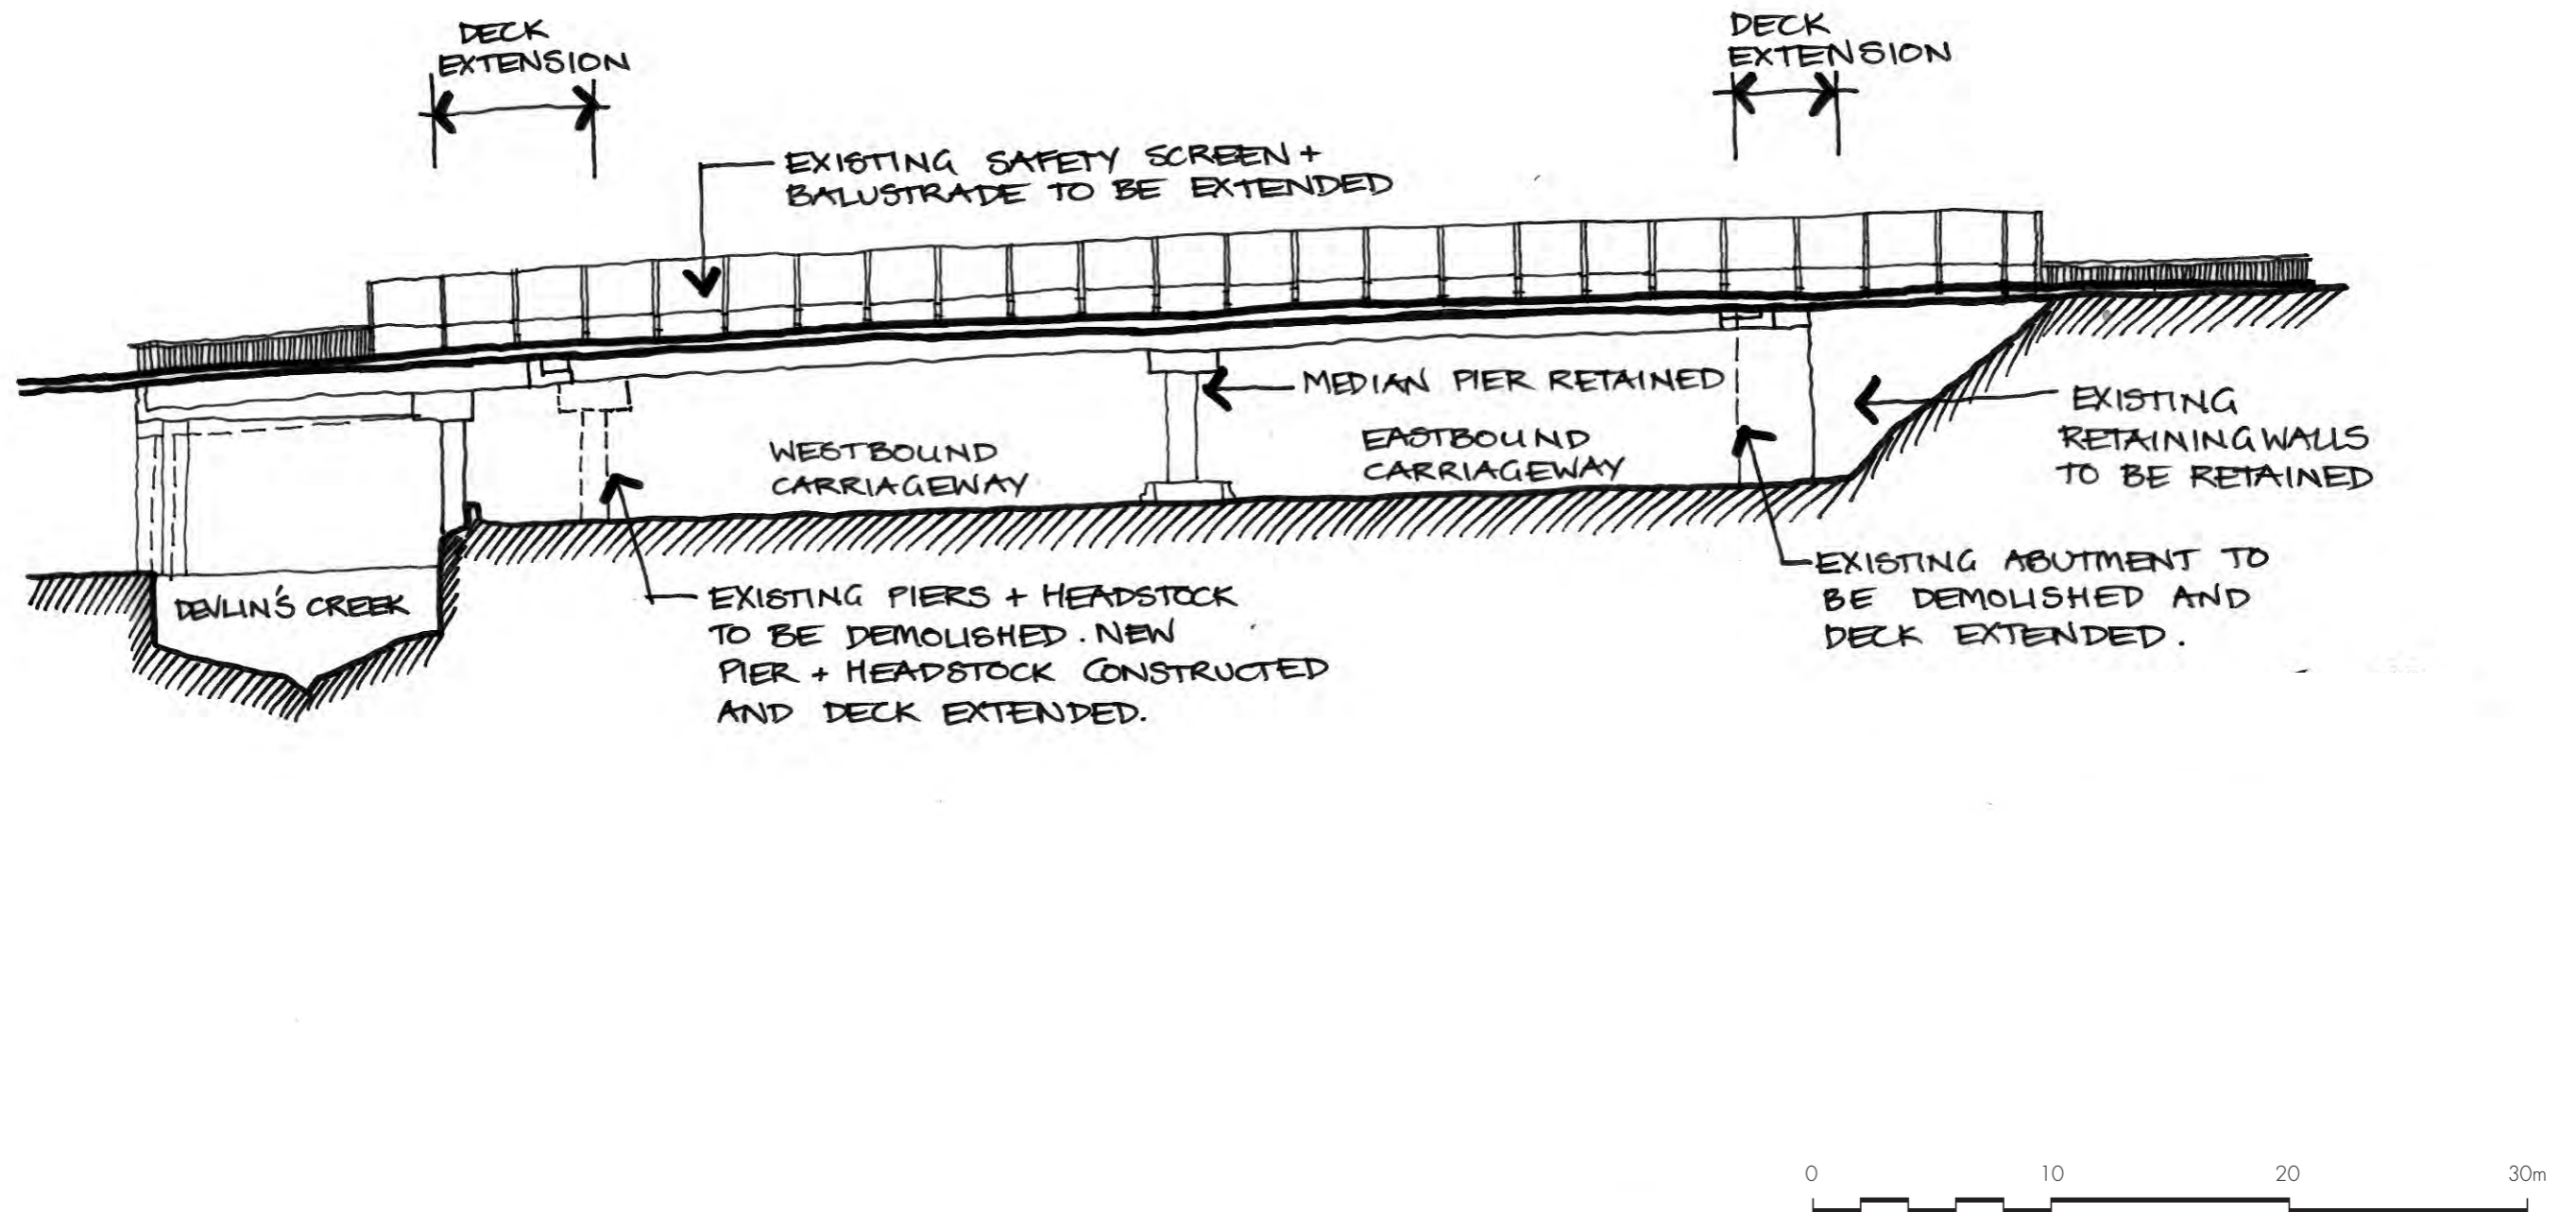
Bridge 2.7 Kirkham Street Overbridge - Elevation
